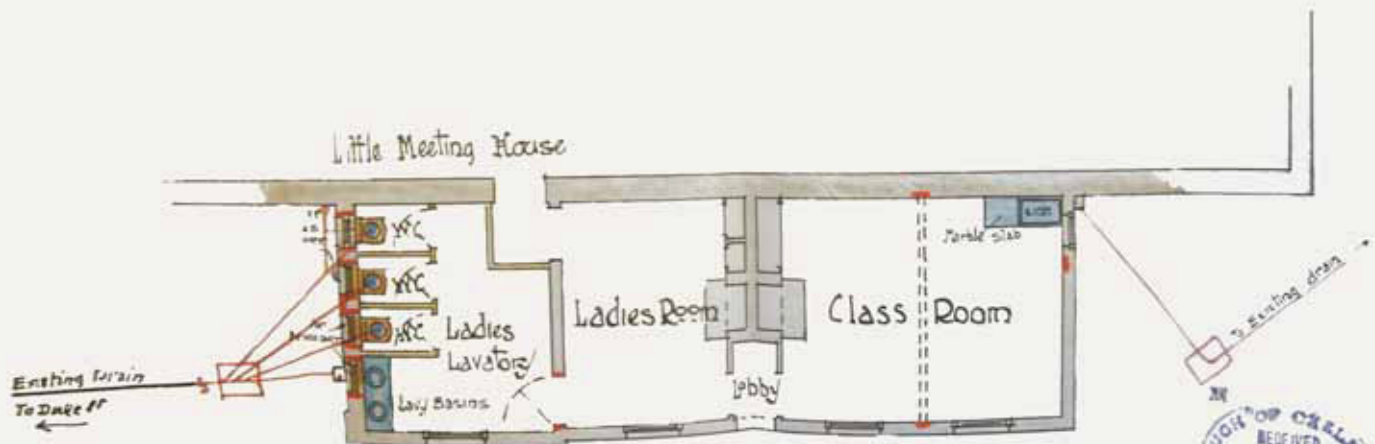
Charles and W.M. Pertwee's plan for proposed drainage works at Friends Meeting House, 1908
